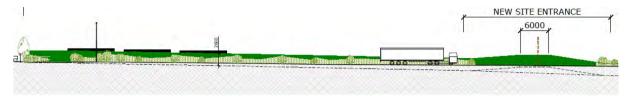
Proposed Elevation Along Road L4700 (1 of 2)
